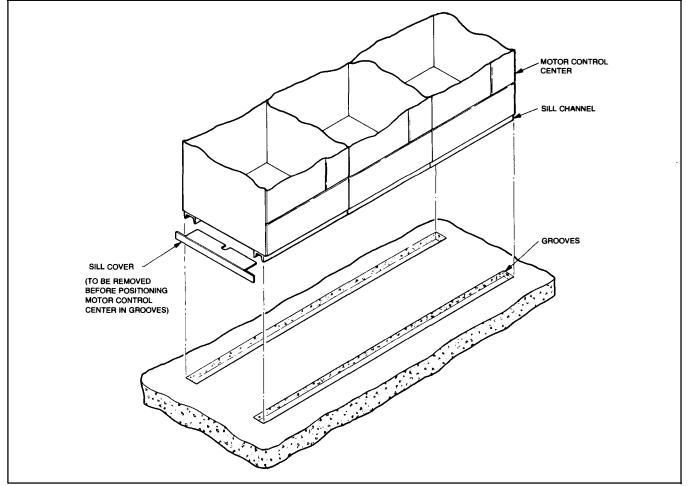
Grouting Method of Fastening Motor Control Center Page 14
